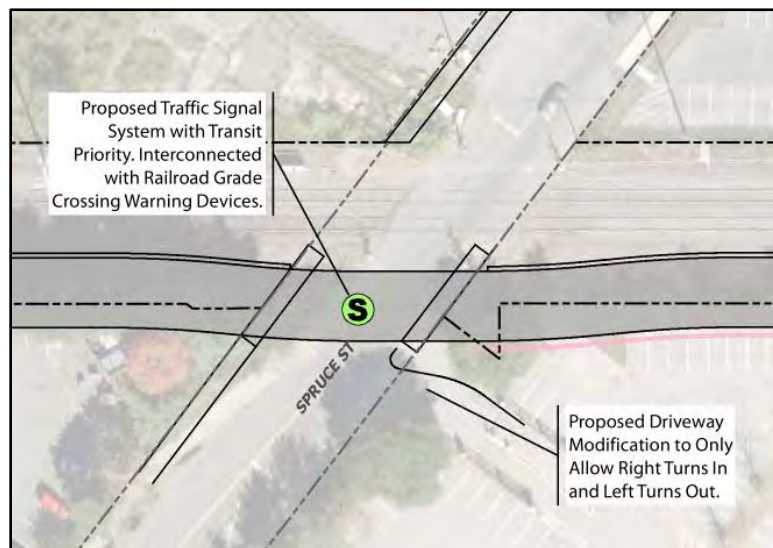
Proposed Intersection Improvements at Everett Avenue
